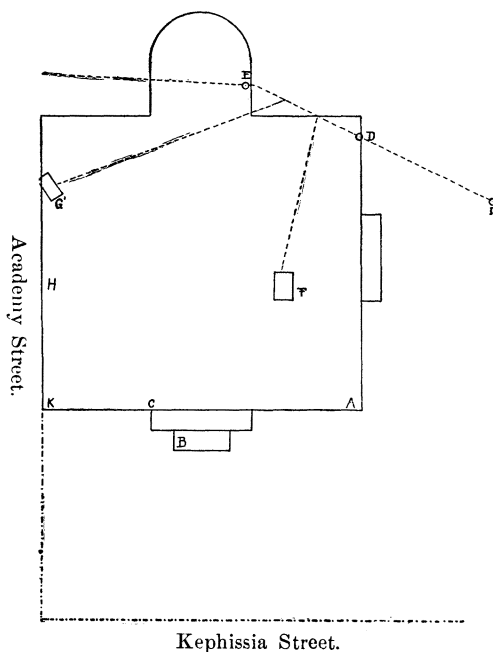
PLAN OF MR. MERLIN'S HOUSE.
